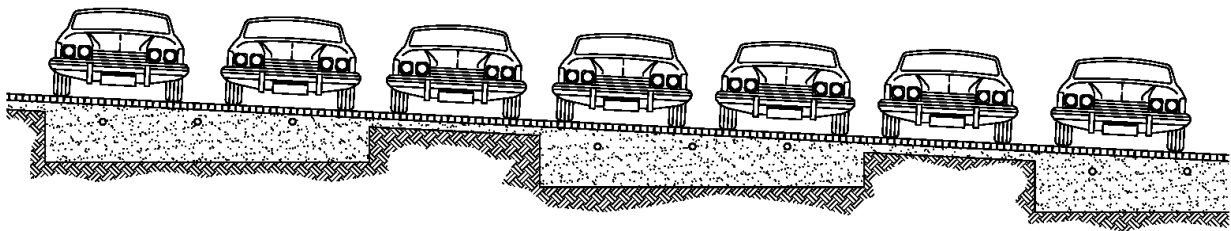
Terraced Storage Bay Profile under Parking Lot
